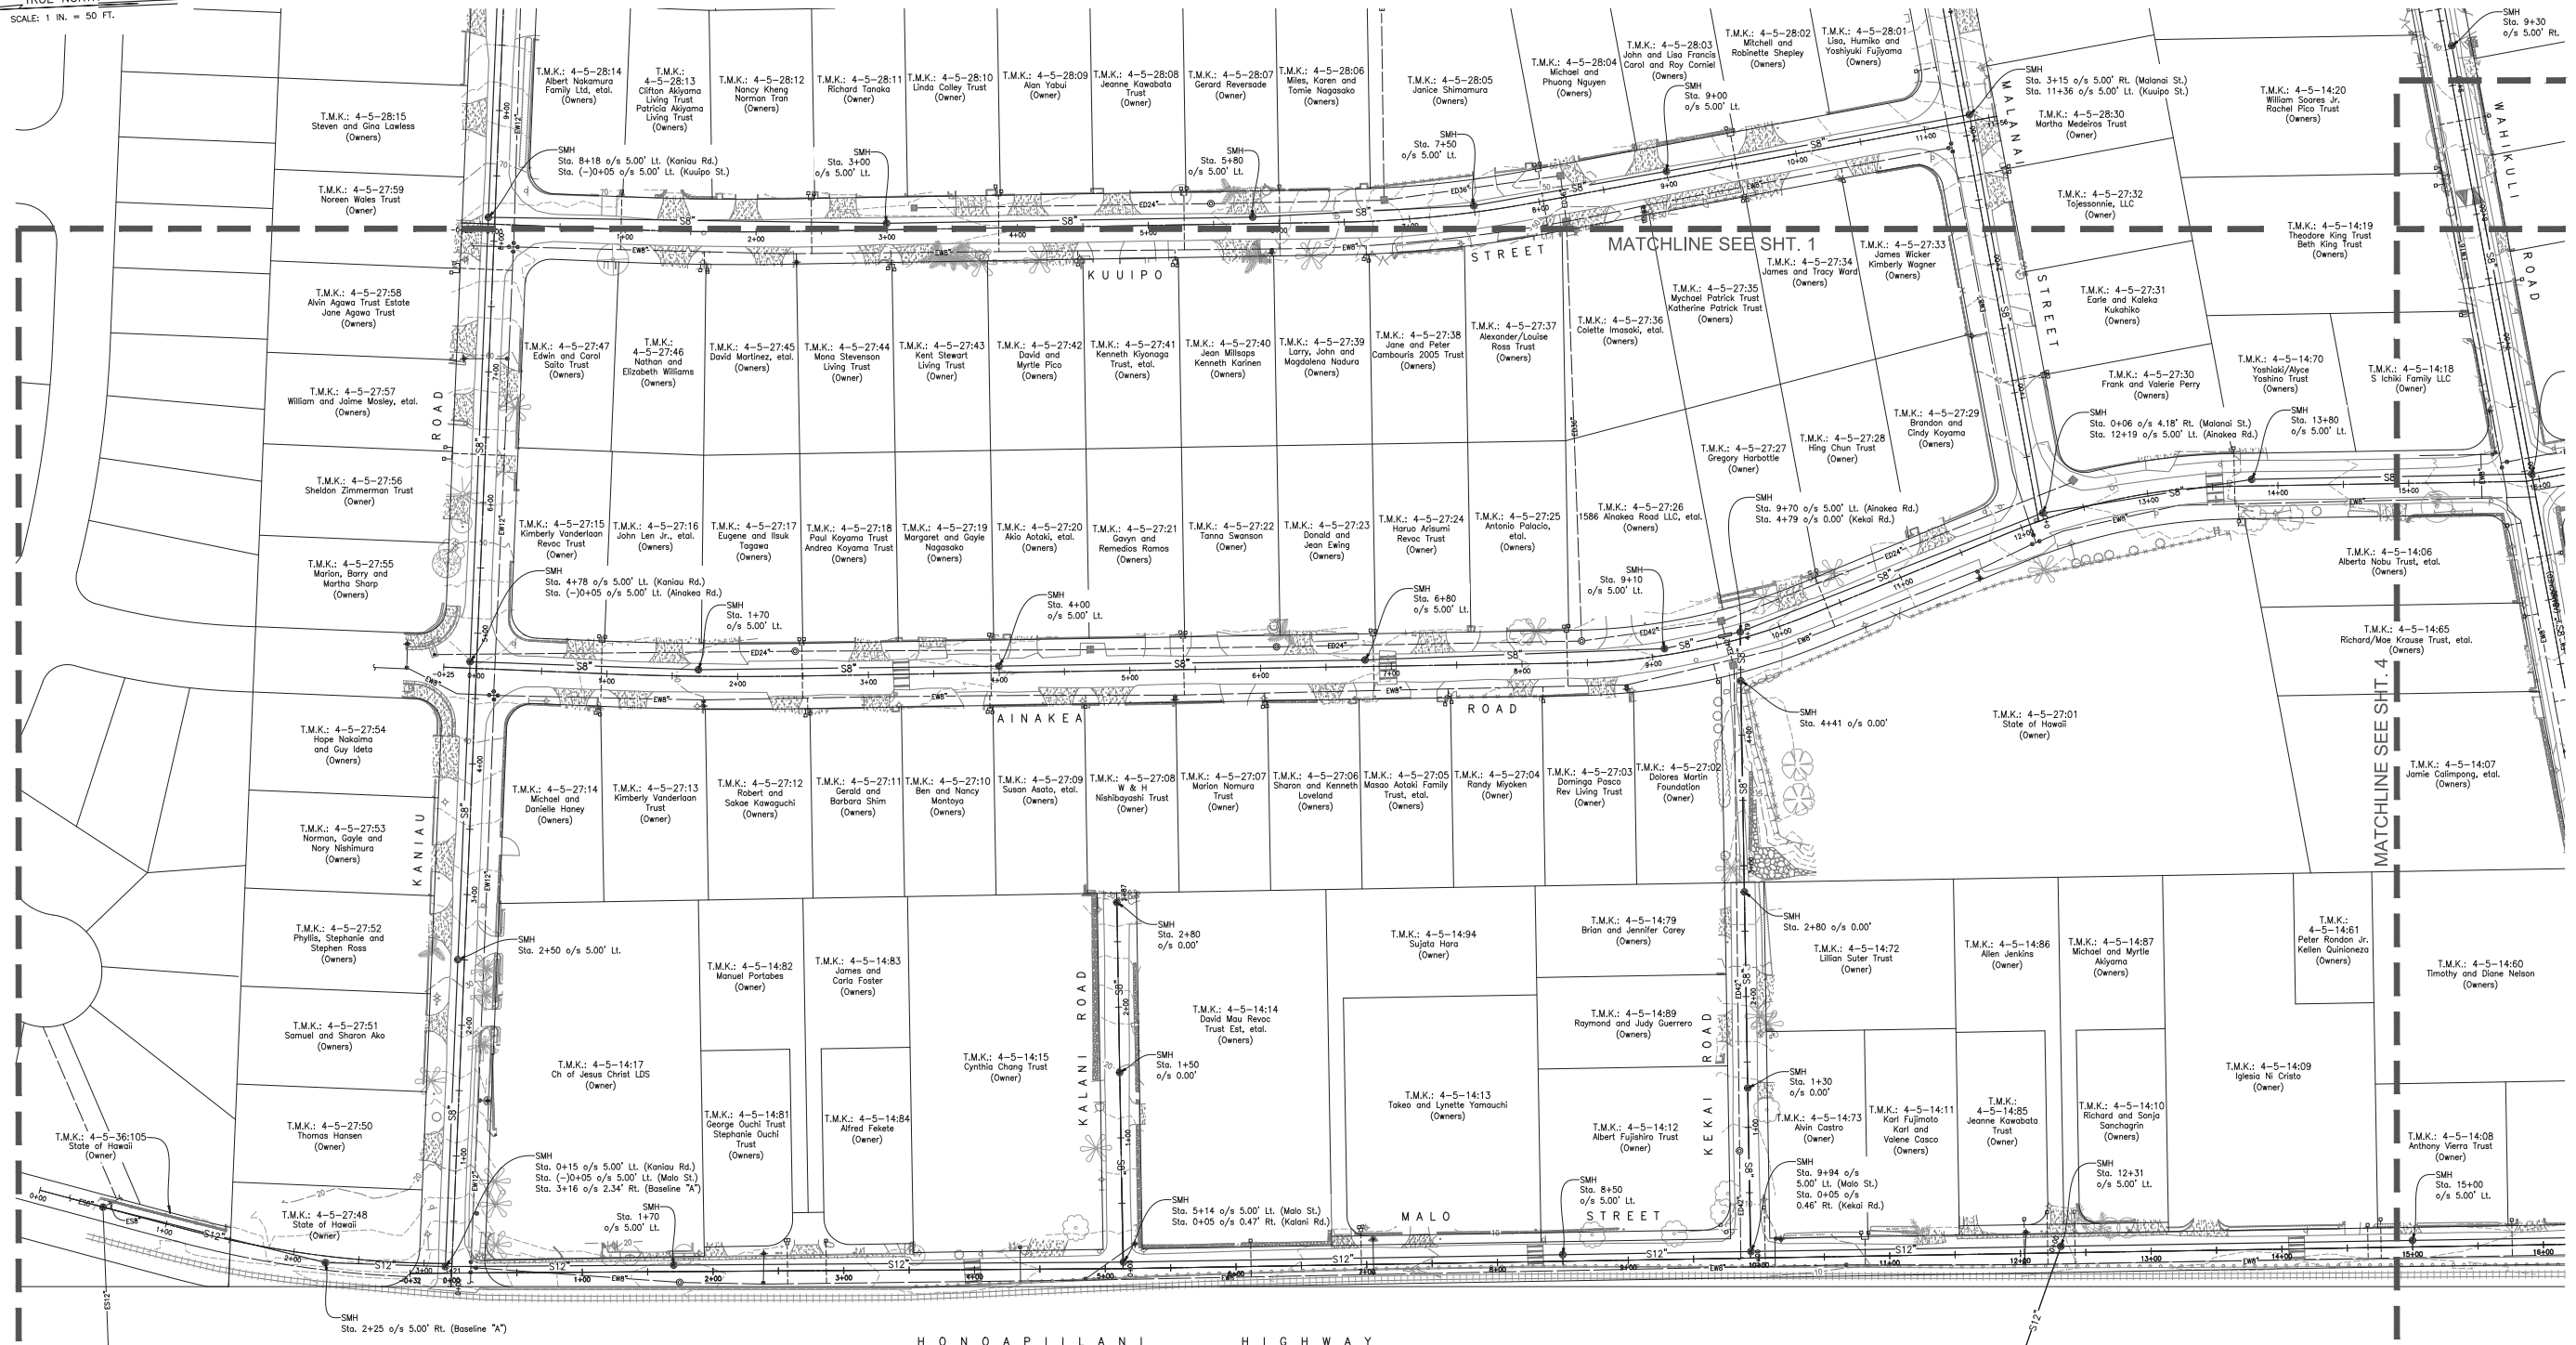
EXHIBIT E - OVERALL SITE PLAN (4 OF 4)
